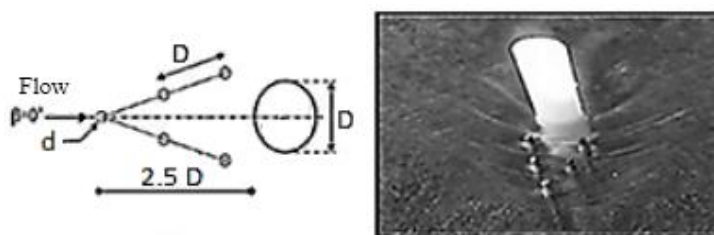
Sketch showing arrangement of sacrificial piles in triangular pattern in front of pier
